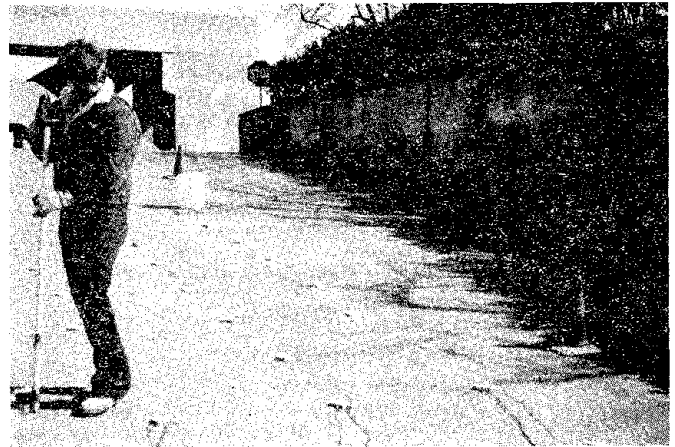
Electrical Half-cell Potential Test to Determine Corrosion Activity on Reinforcement.
